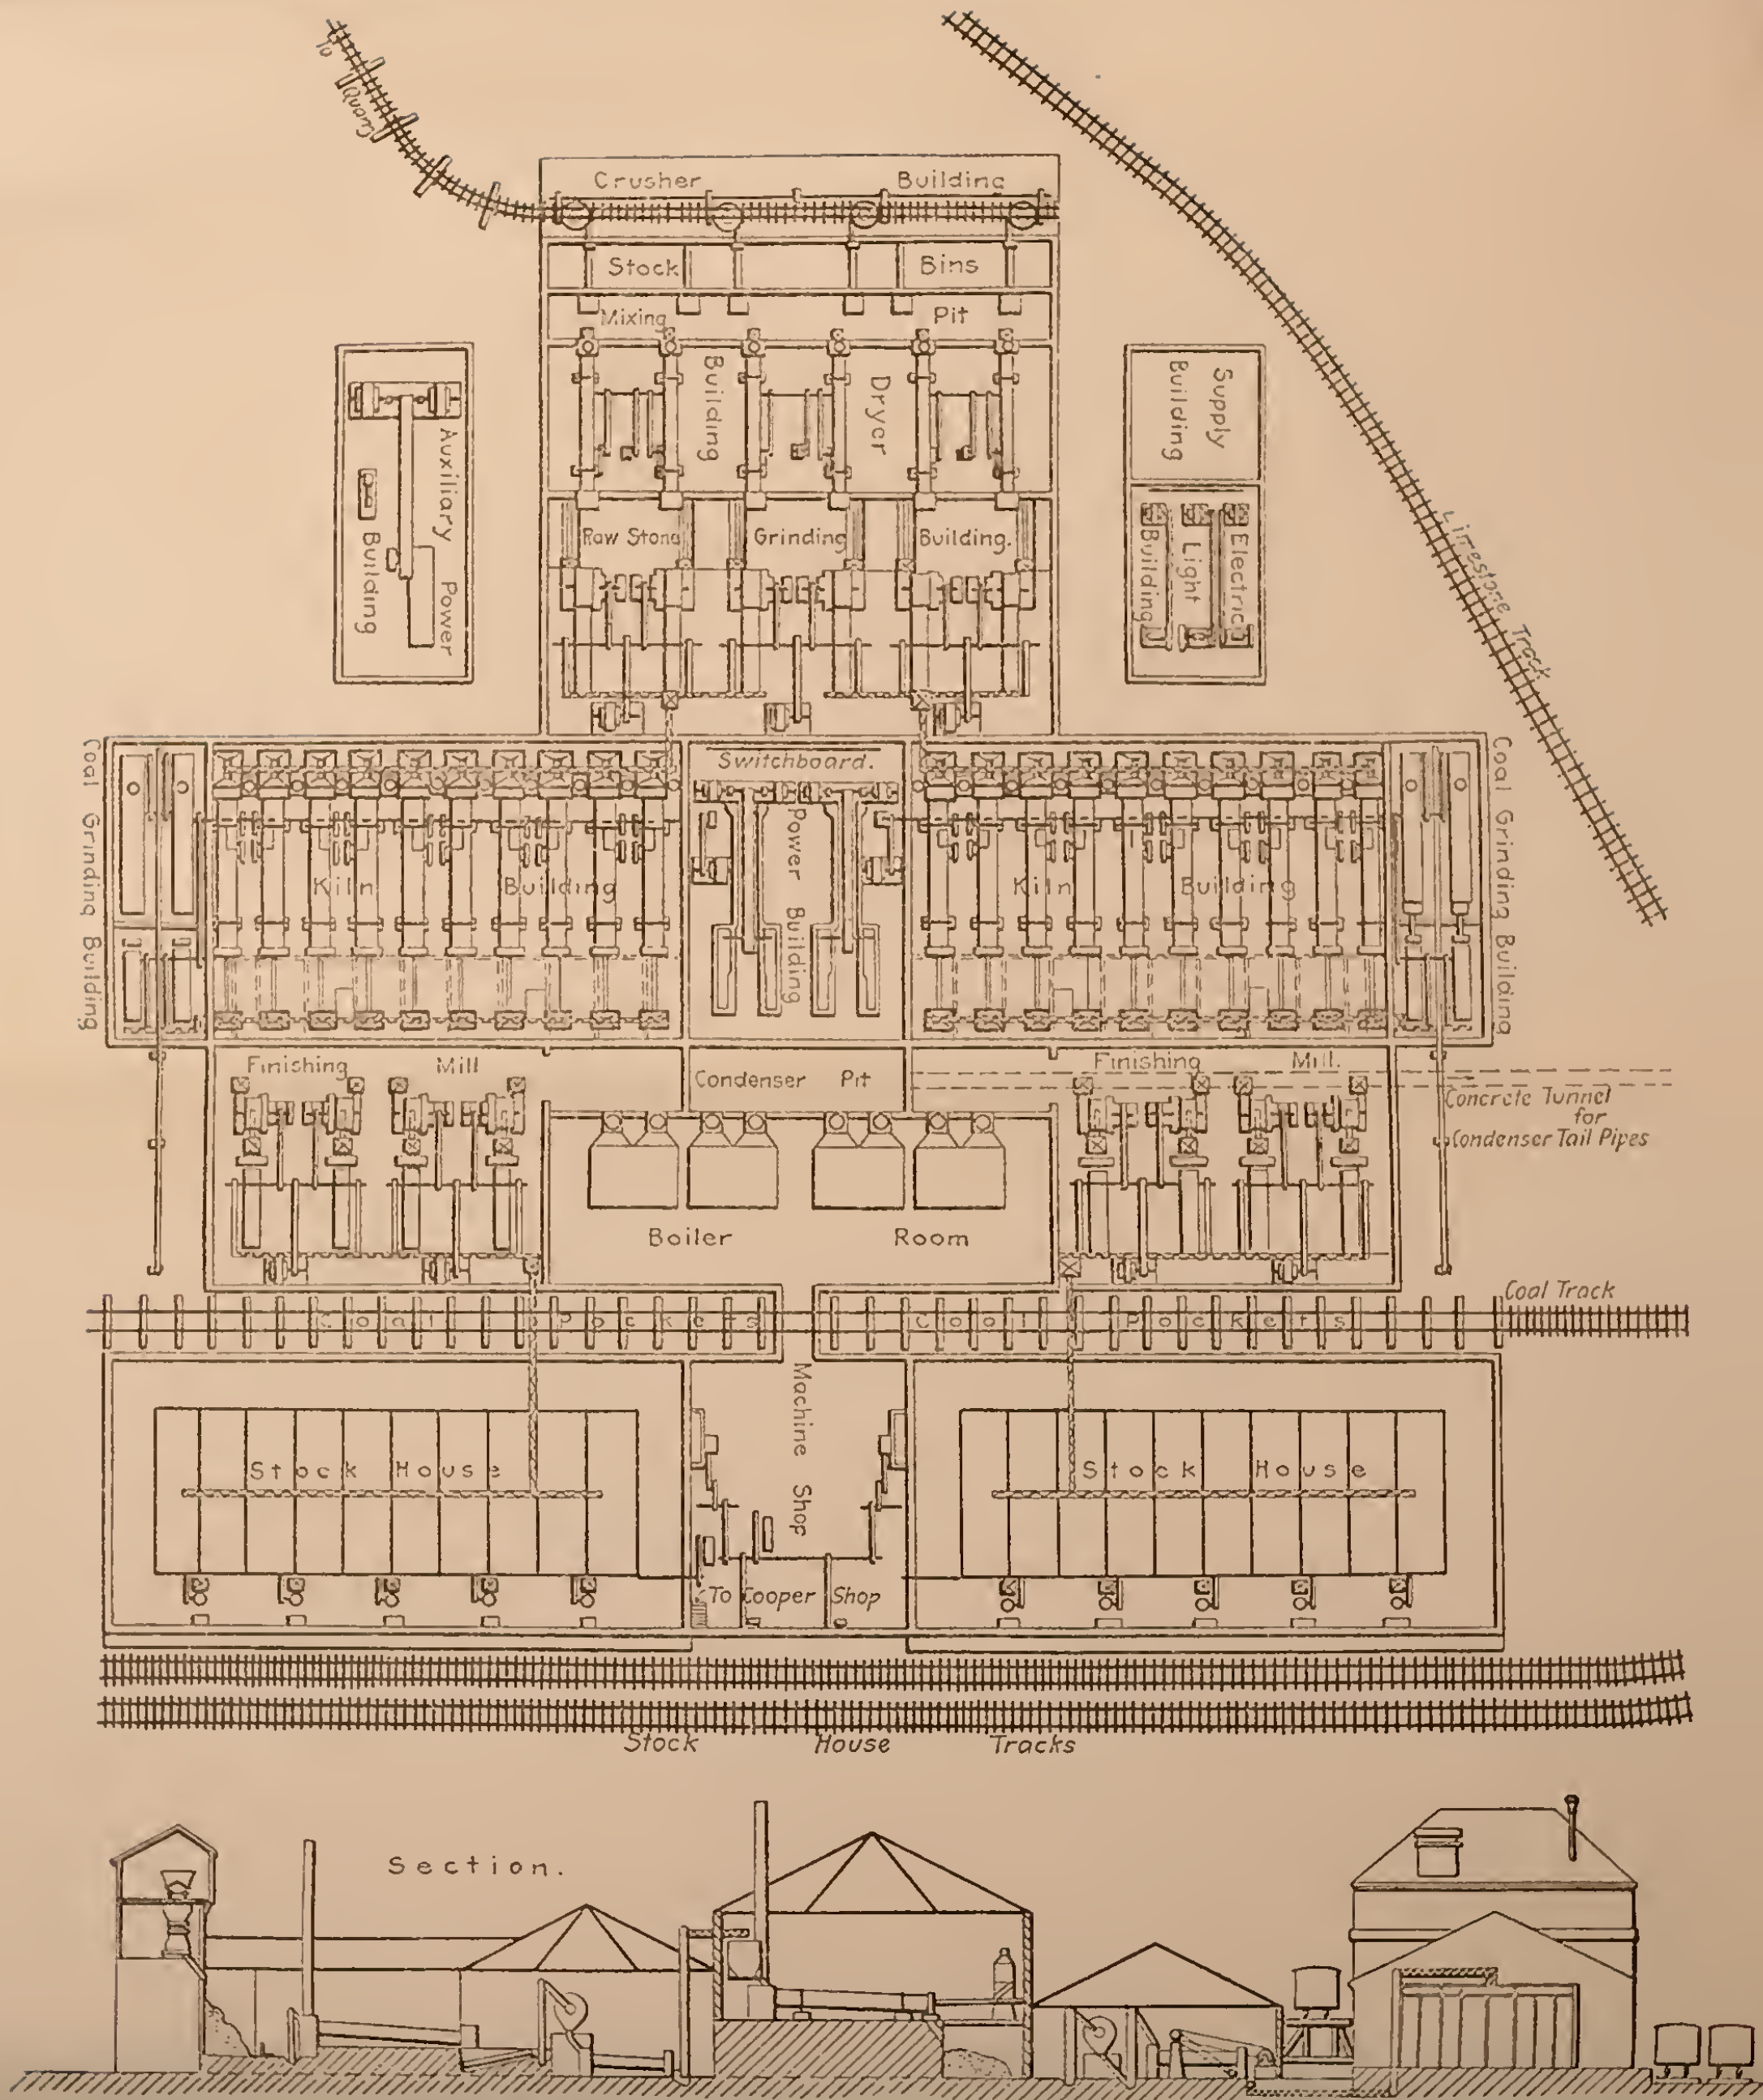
PLAN AND SECTION OF A PORTLAND CEMENT MILL USING THE DRY PROCESS WITH ROTARY KILNS.
